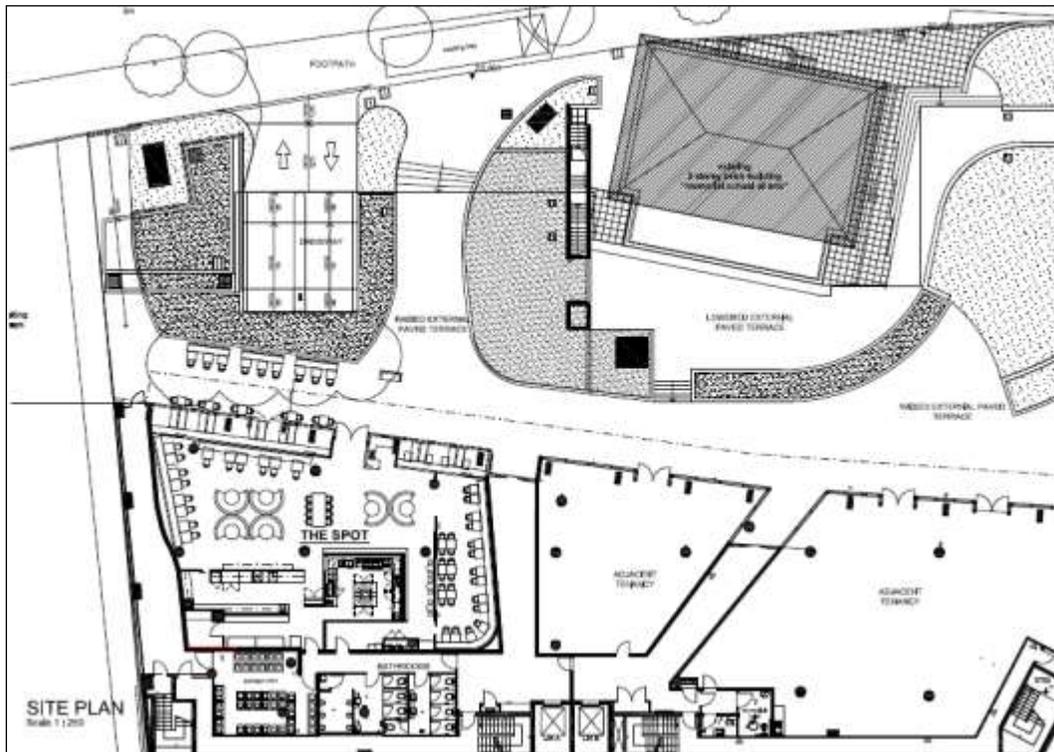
Site plan showing the existing loading bay and Shops 1 and 2 in the site context (source: TS-DA-001 prepared by Brad Ward Design).
